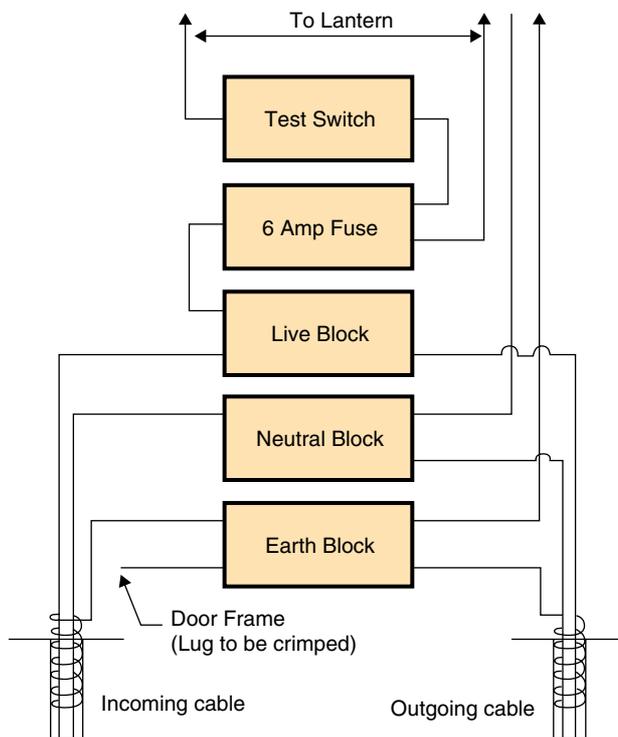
INTERNAL ELECTRICAL ARRANGEMENT PUBLIC LIGHTING COLUMN
